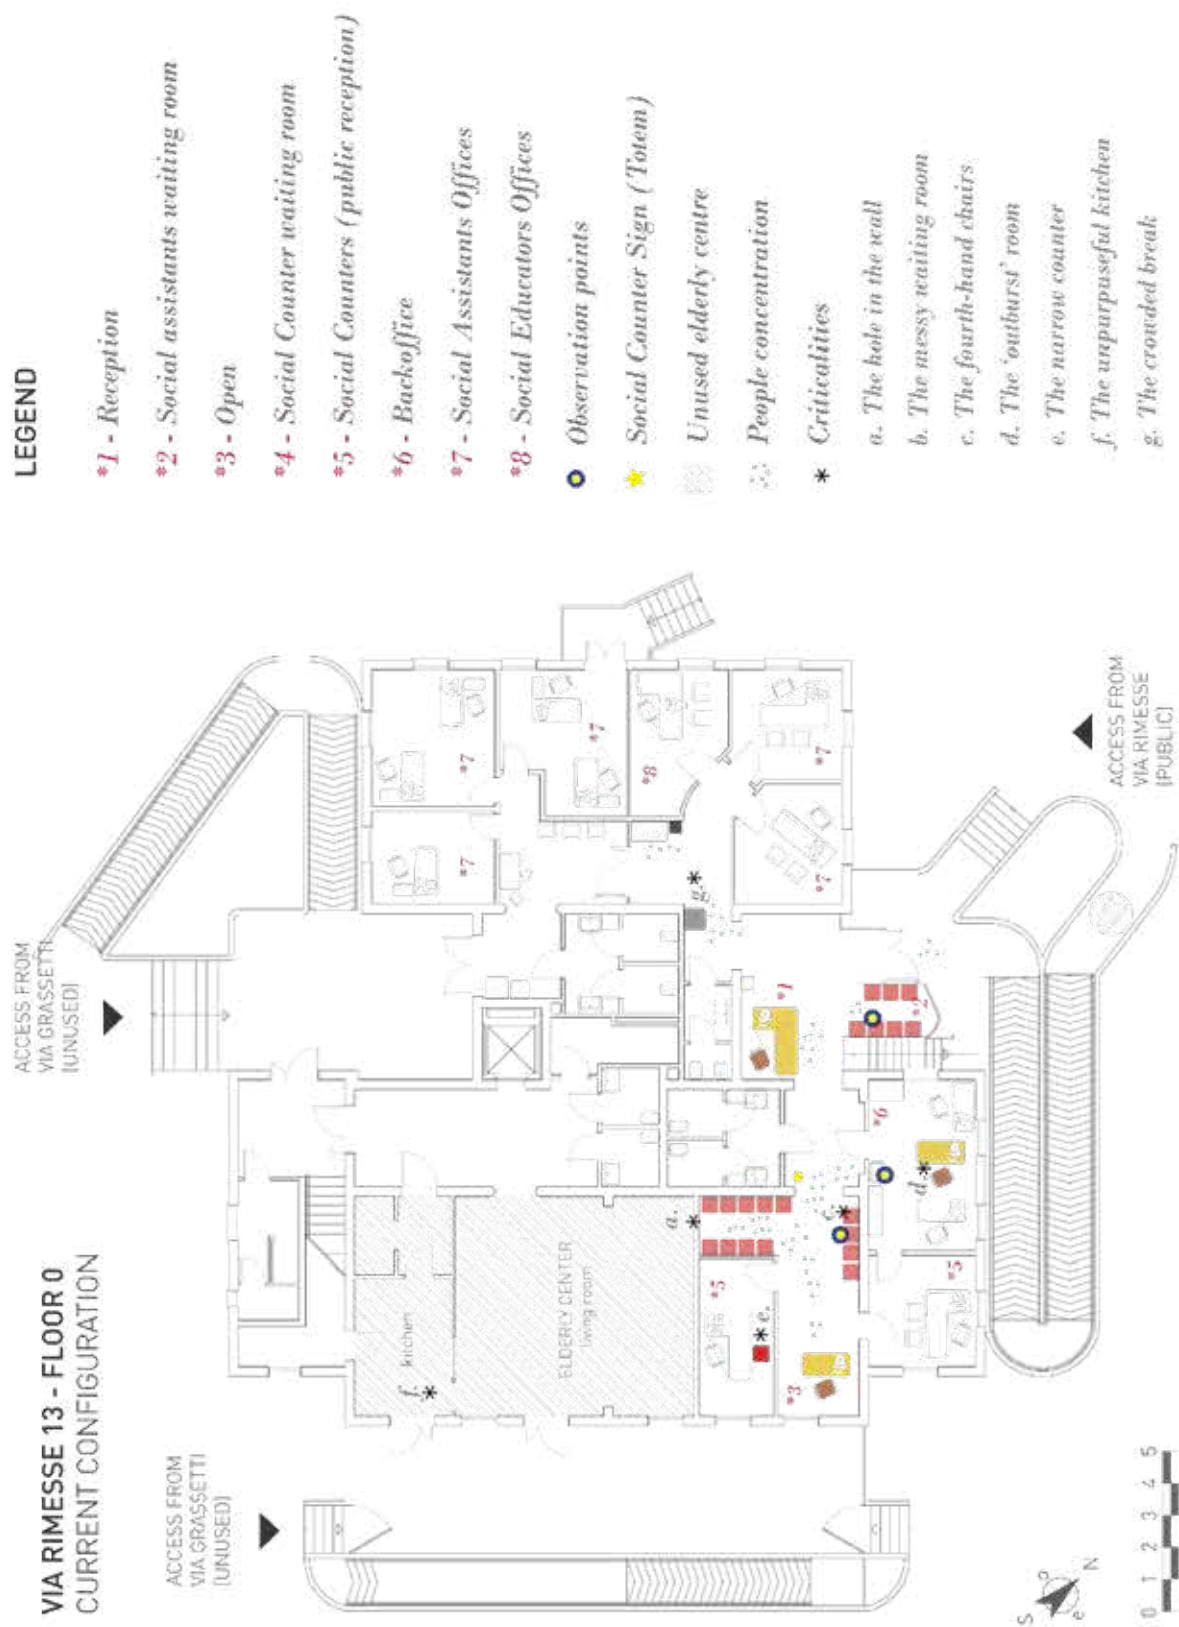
Plan of the building in via Rimesse 13, Bologna. Elaboration of the author from the direct observations and the cadastral plan.
